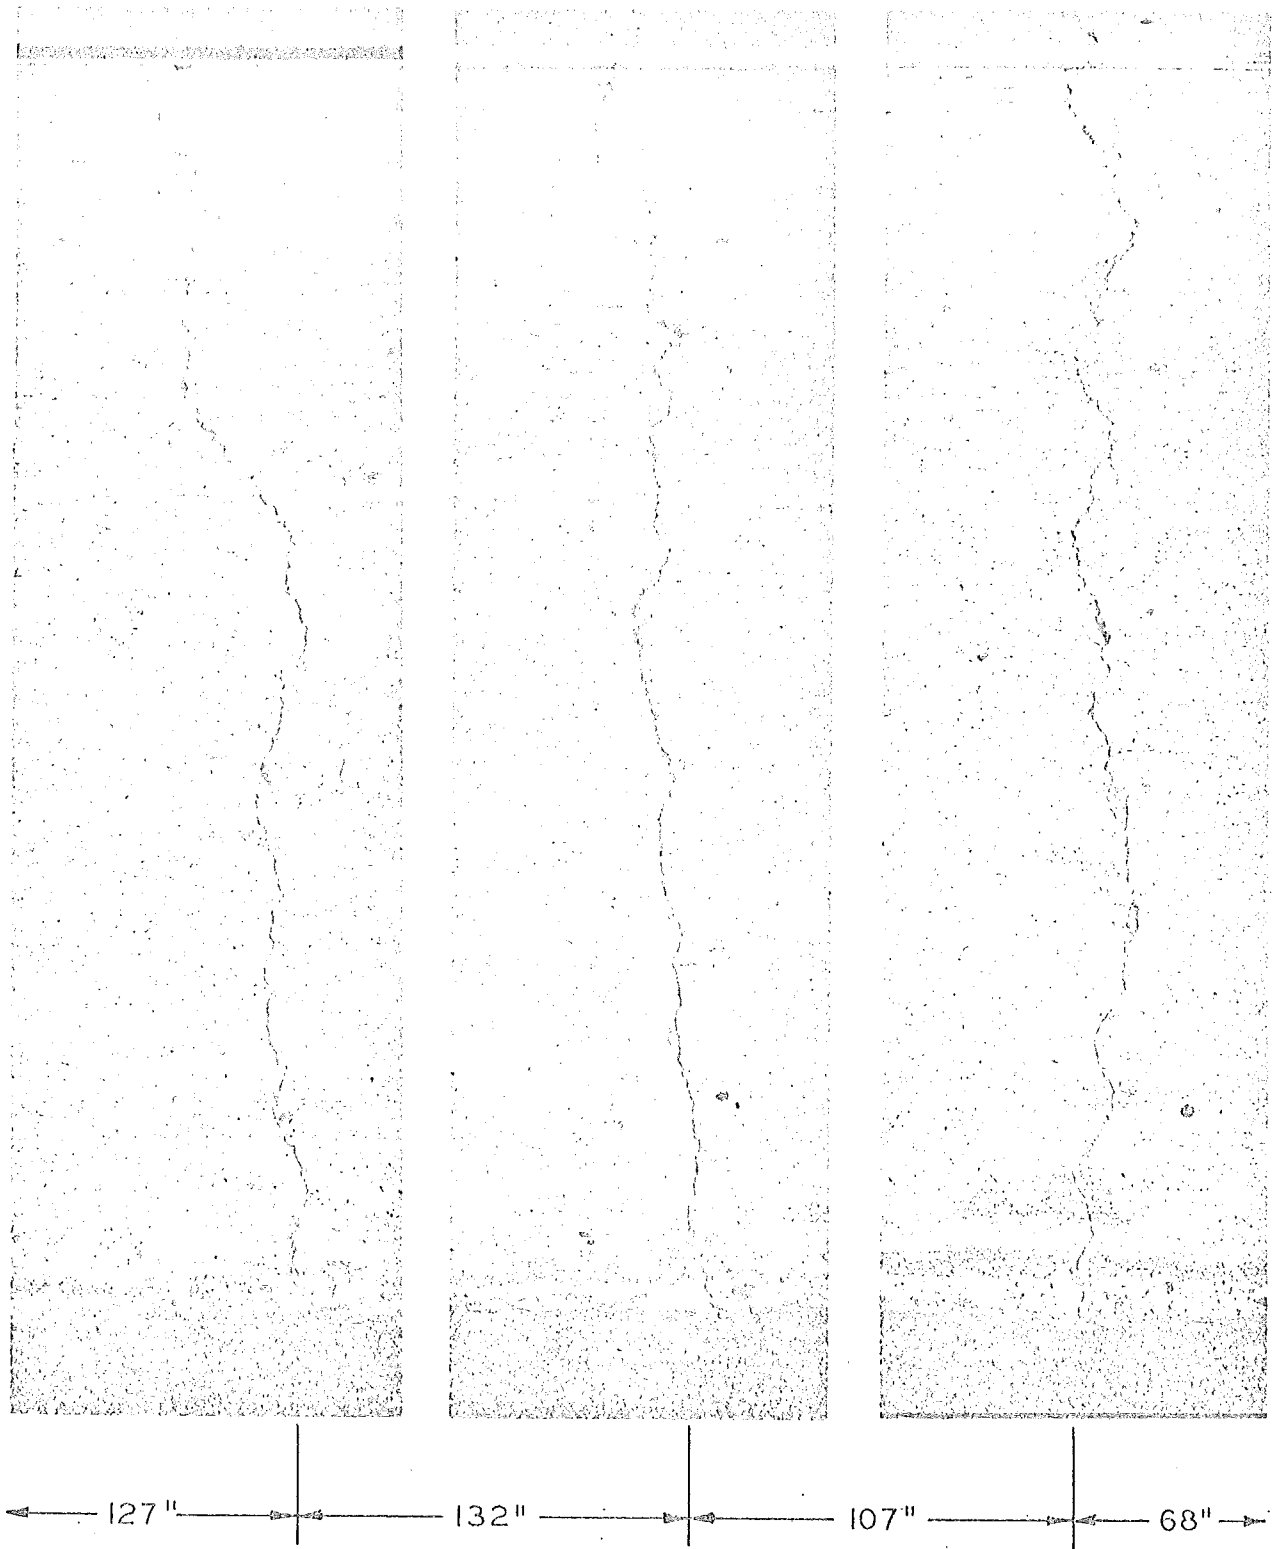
Appearance of cracks in area of large crack spacing in wire mesh section.
